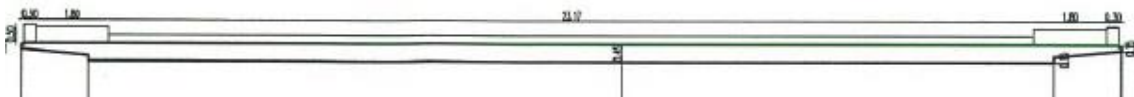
Cross section of arch slab in the hinge (section 2-2)
